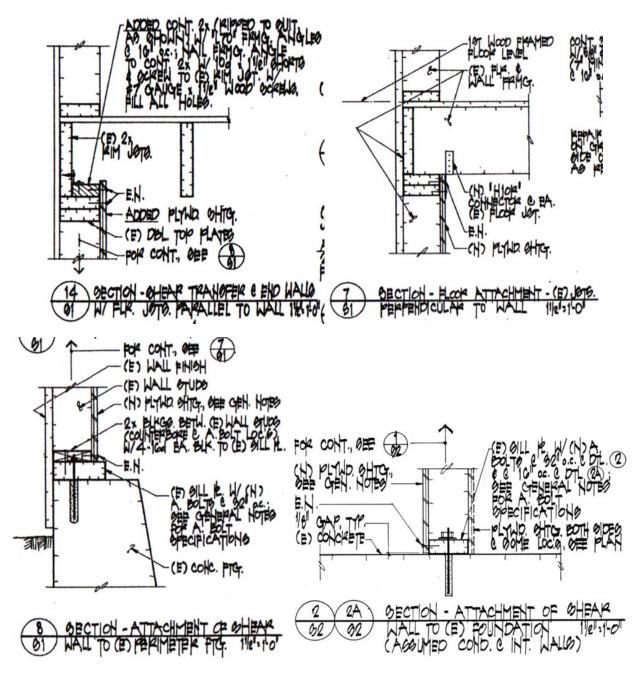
Selected Structural Retrofit Details (1994 drawings)
